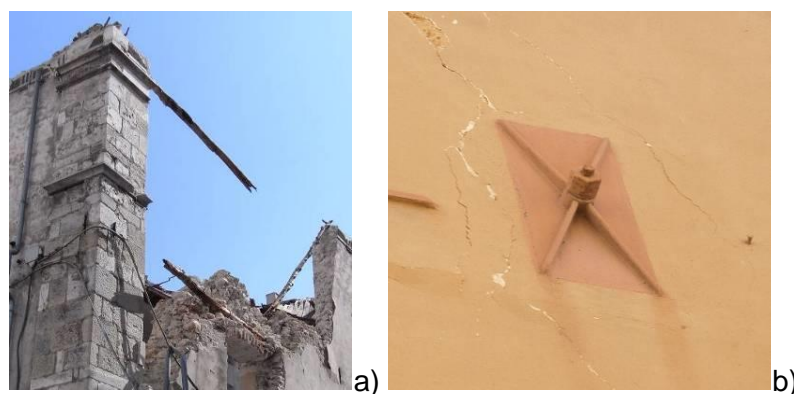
Examples of failed steel cross-ties: a) material failure by tension of a timber tie; b) punching shear failure of the anchor plate through the masonry wall
